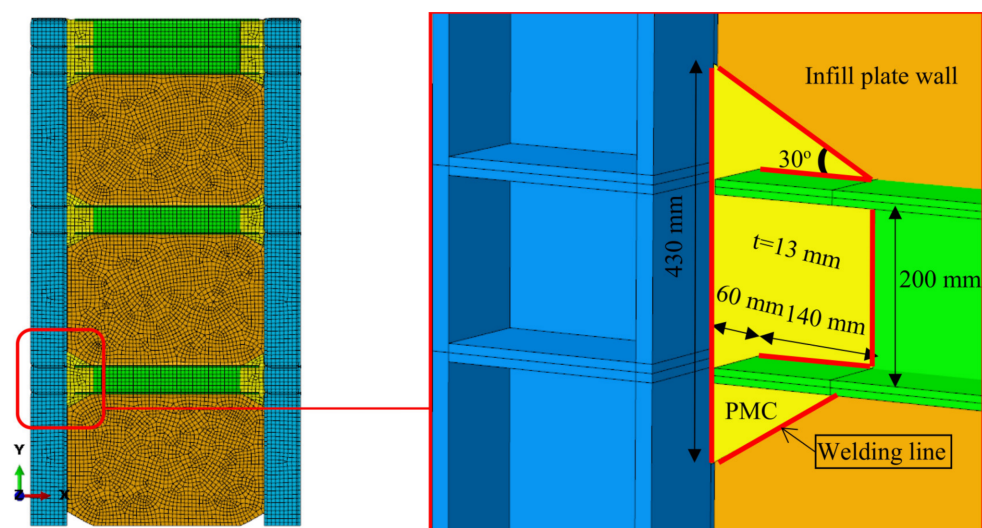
Geometrical features and location of the absorber plate in the steel plate shear walls (SPSW) system.
